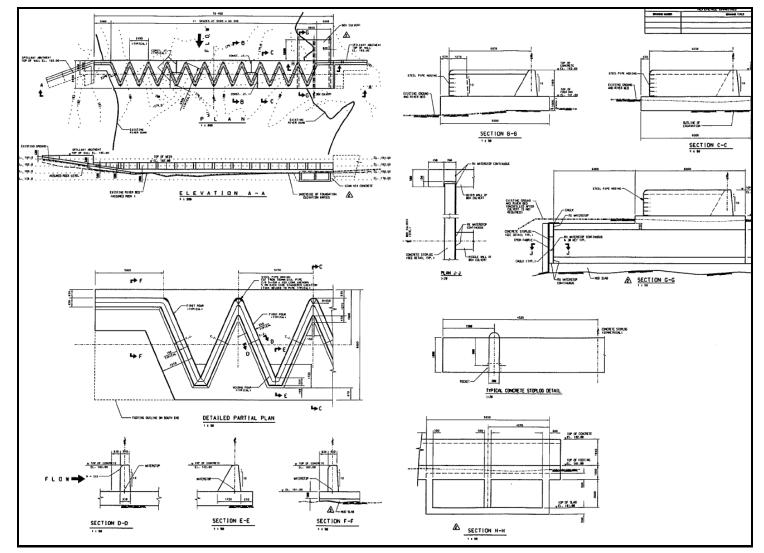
Snare Cascades G.S. – Labyrinth Spillway Sections and Details
